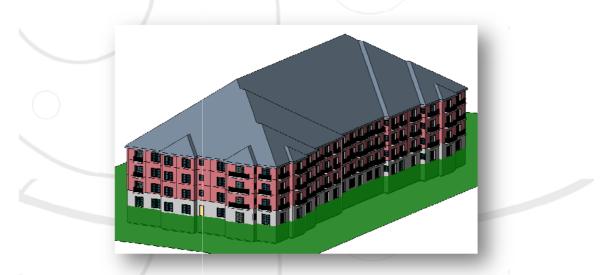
B: Thin Brick Precast Panel Façade Render Utilizing Autodesk Revit®
